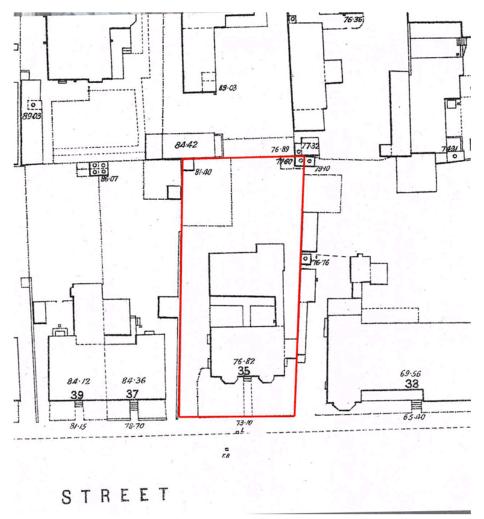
Detail of 1907 Metropolitan Drainage Board survey showing the subject site and surrounds (Hobart Sheet 9).
